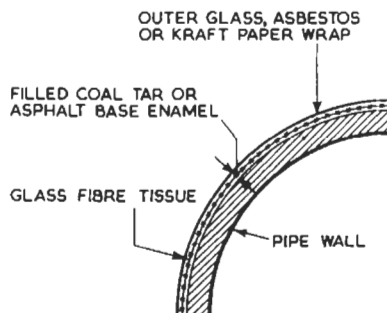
Type of coating produced by mechanical flood coat and wrap machine
